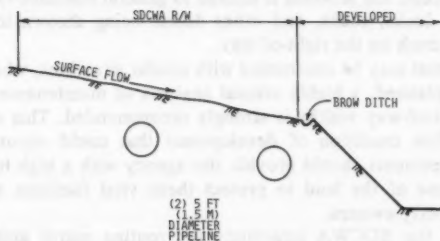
Development Adjacent to Right-of-Way Included Brow Ditch of Insufficient Cross Section and Lateral Slope to Provide Drainage
